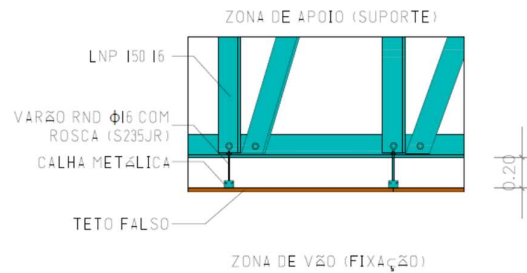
1st Roof Solution Dropped Ceiling Detail (19)
